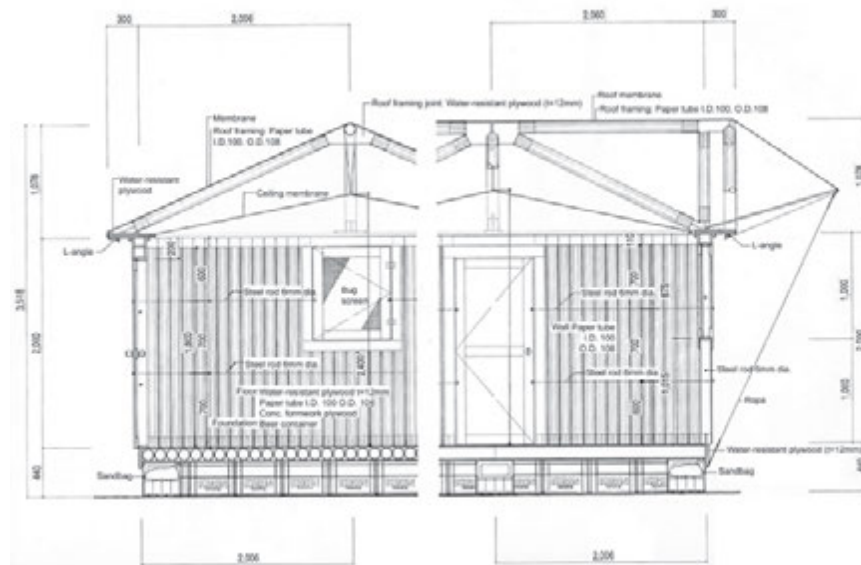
Paper Log House in Kobe, Japan – detailed section, 1995
